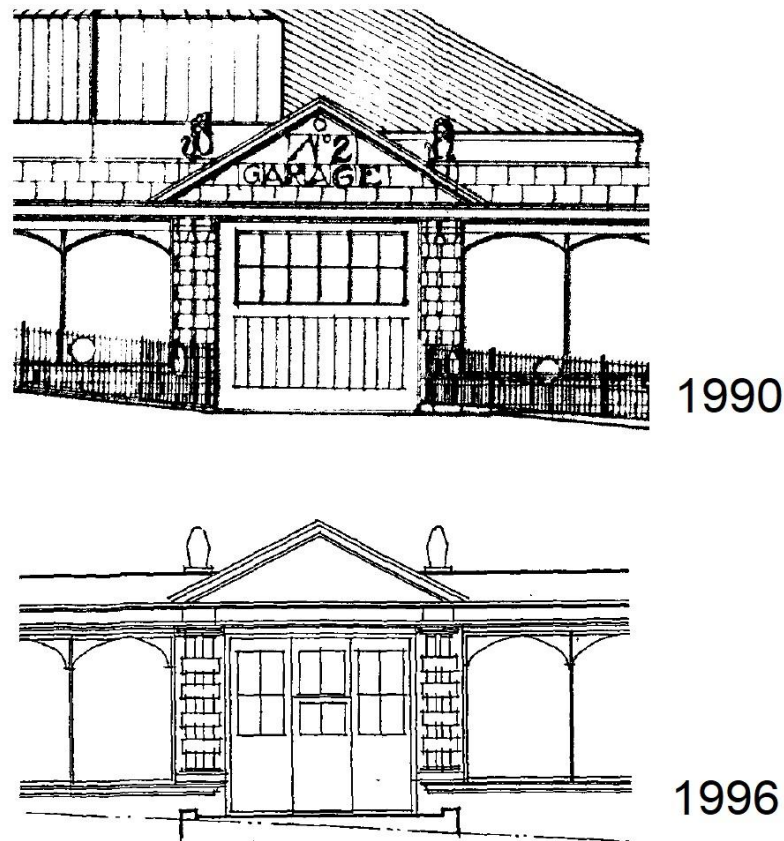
Doors to Princes Street in 1990 and 1996 surveys.
